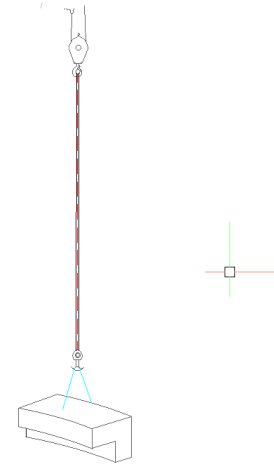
How to fasten and restrain a concrete piece with a crane hook
